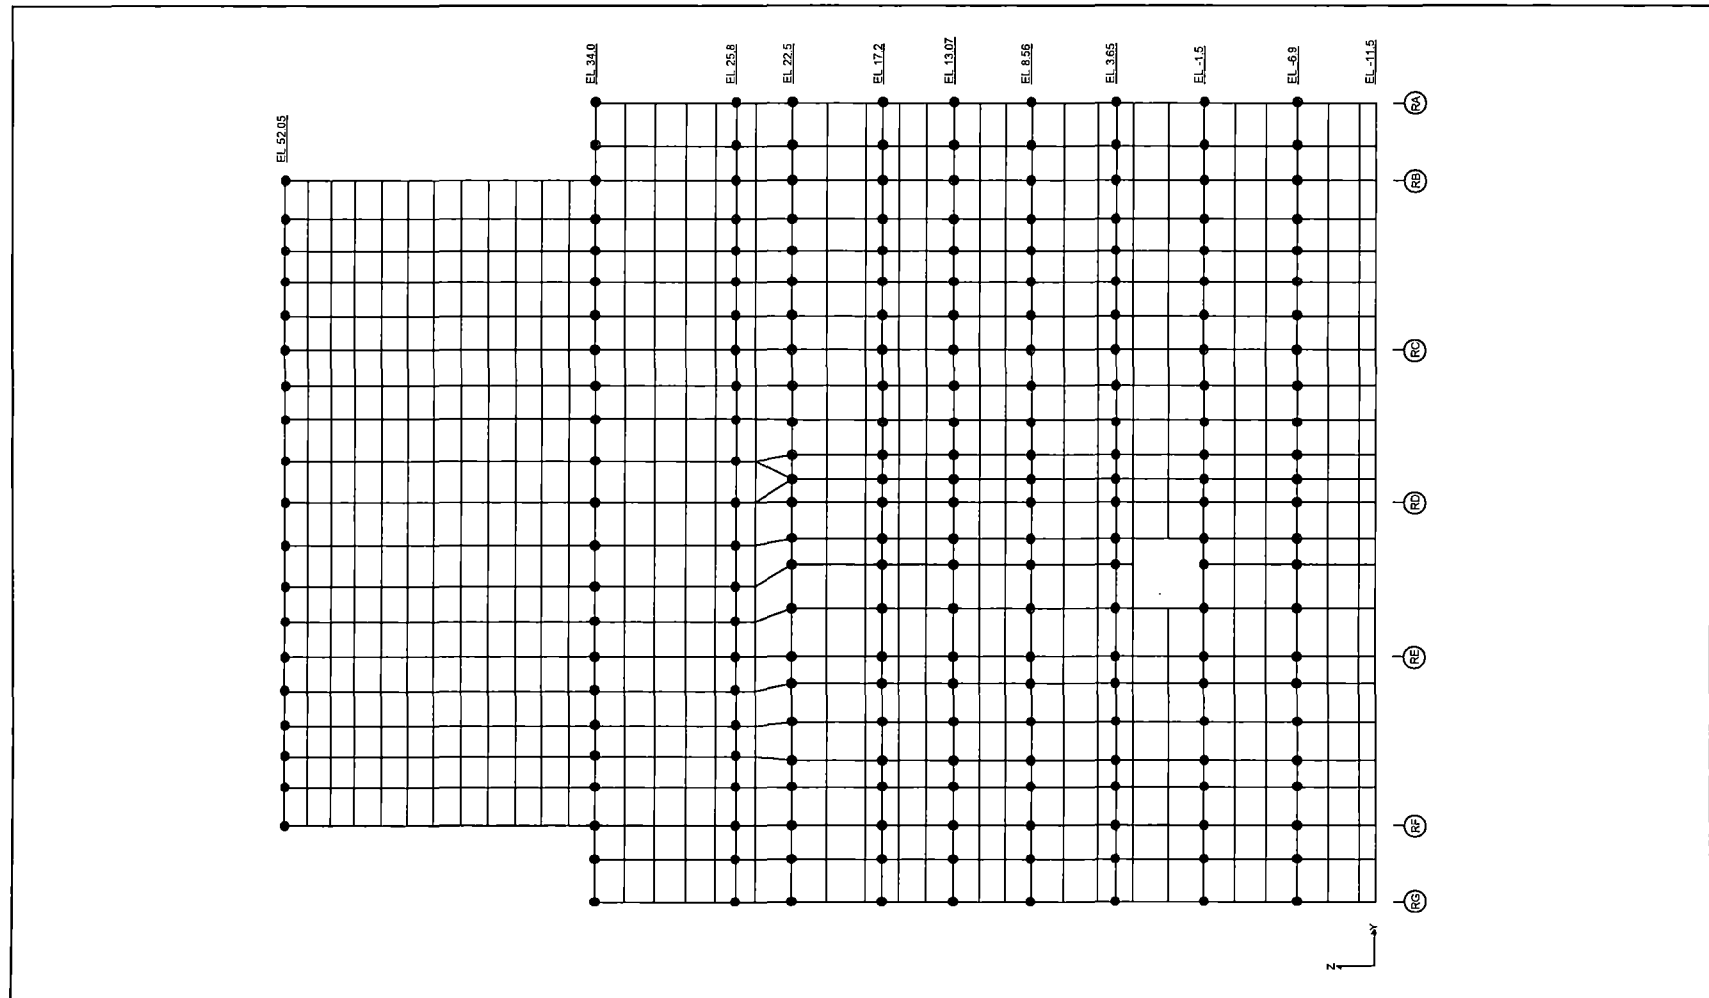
Application of Overturning Moments to the External Wall on R7 Column Line
